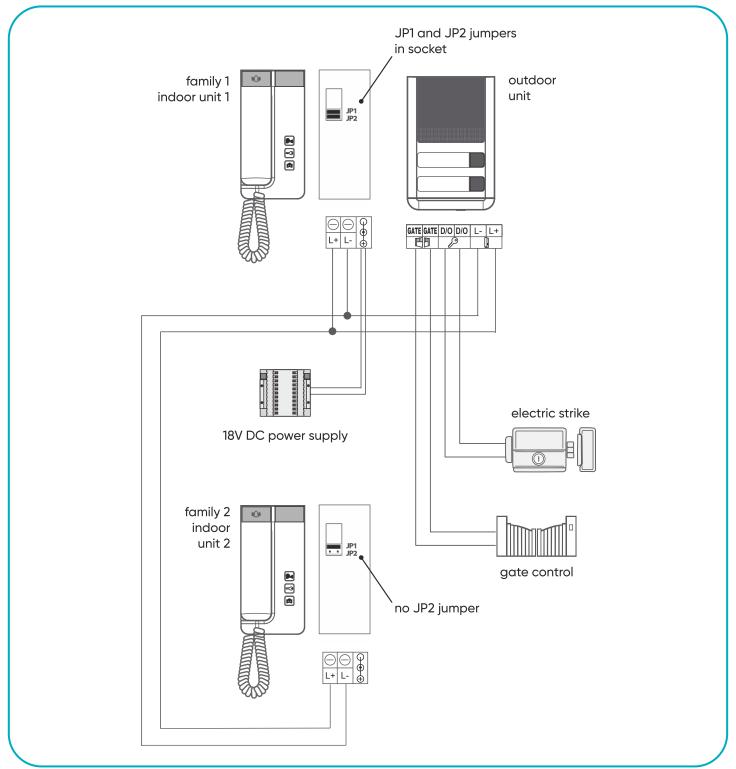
Connection diagram for two indoor units with an outdoor unit, electric strike, and gate control system (applicable to the OR-DOM-SL-924 set)
